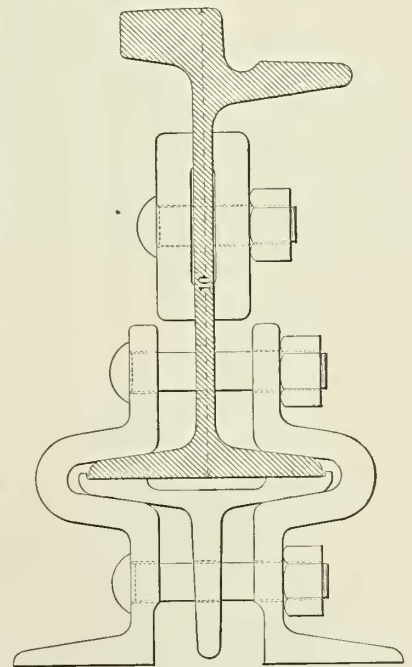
PROPOSED HIGH GIRDER RAIL.
